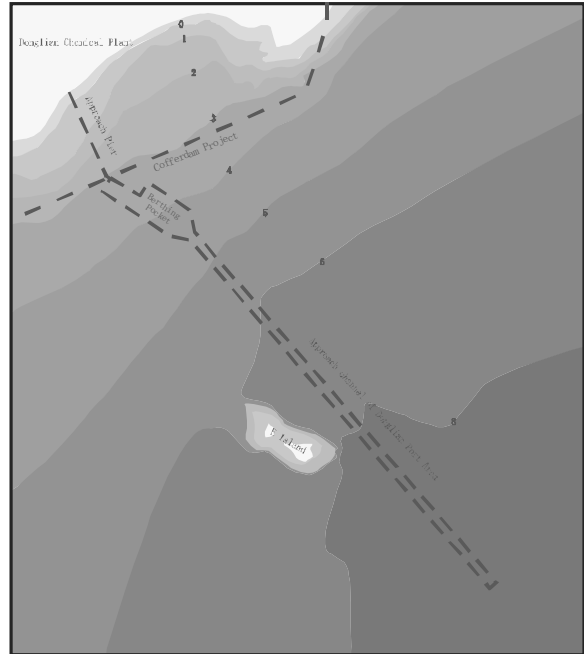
Plan layout of Nanhai etorchemicals Donglian port area (layout)
